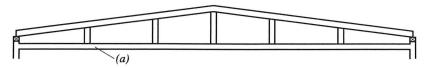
Typical sketch of a timber roof structure on a concrete slab; (a) concrete.
